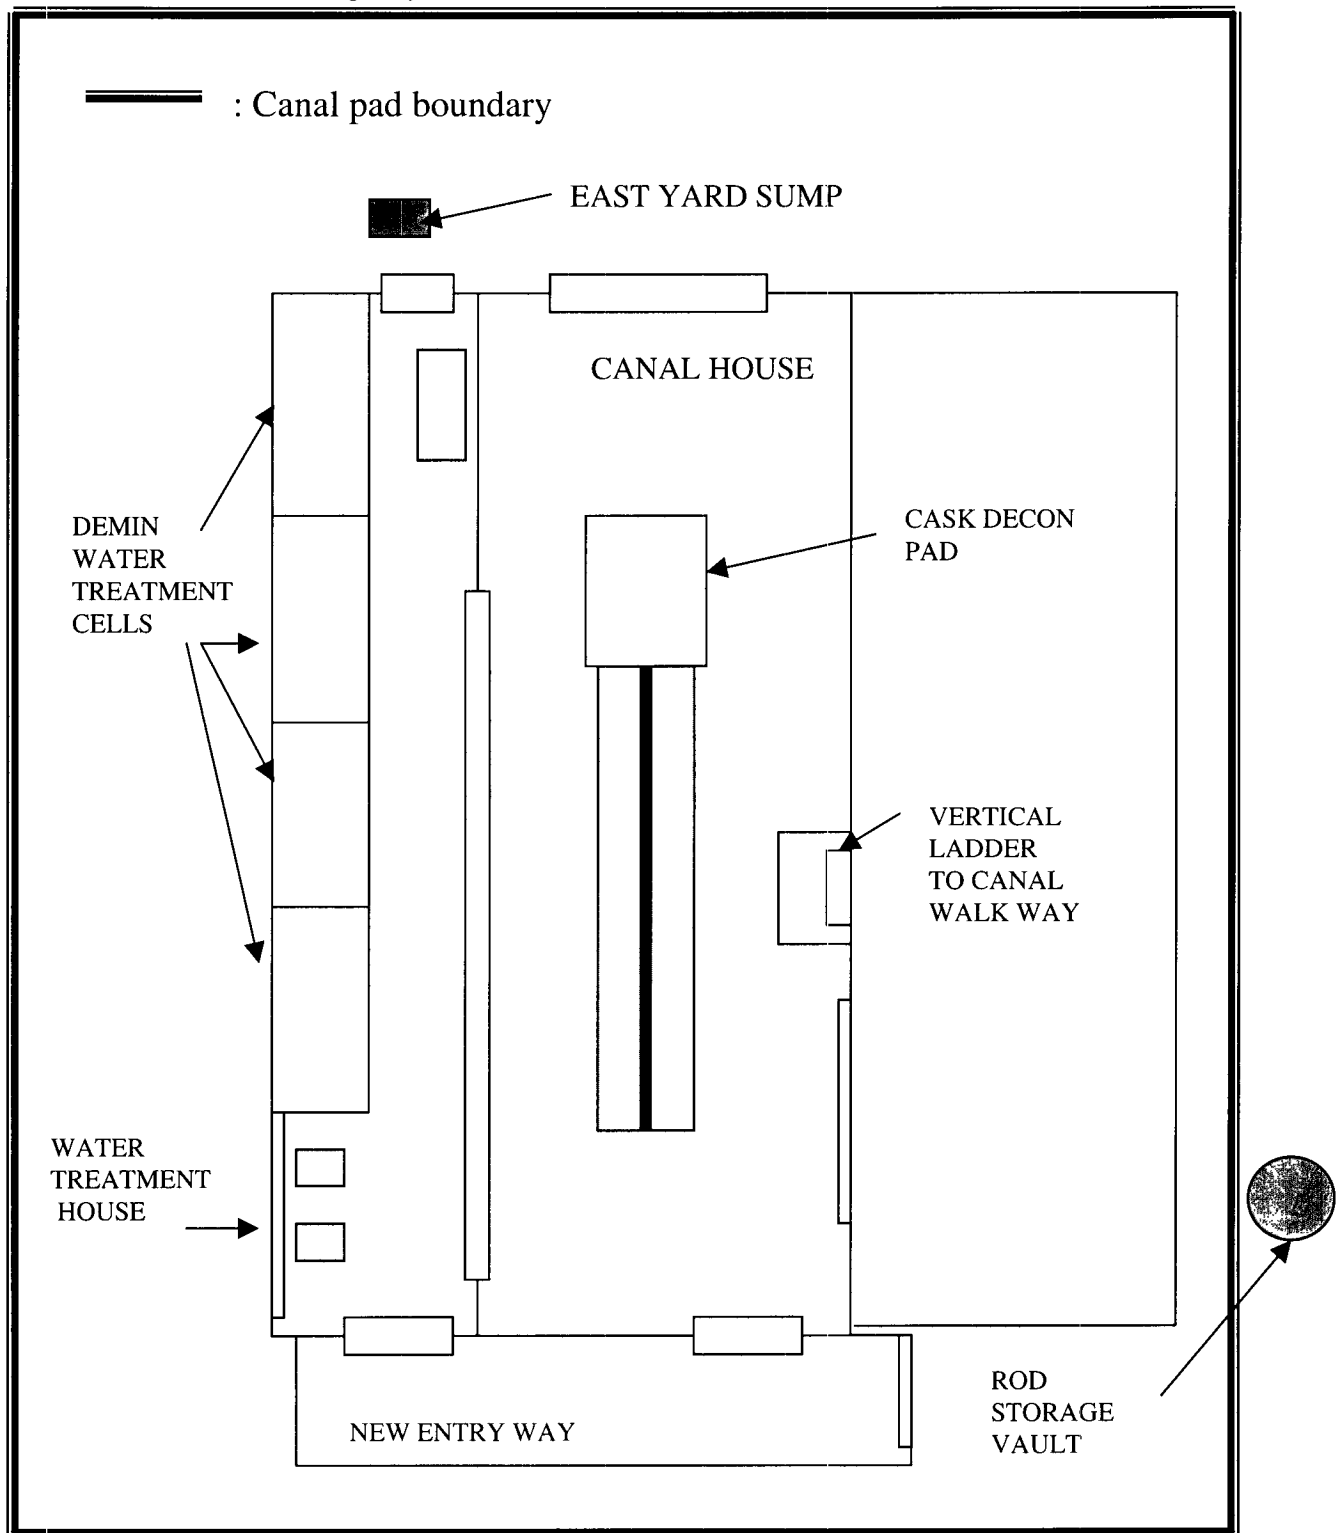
Building 709A, Water Treatment House and Outdoor Pad
